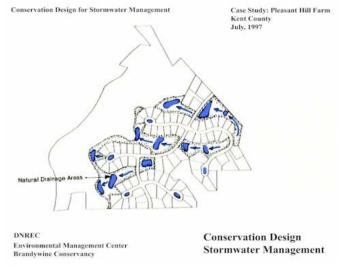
The natural surface can provide stormwater drainage pathways
